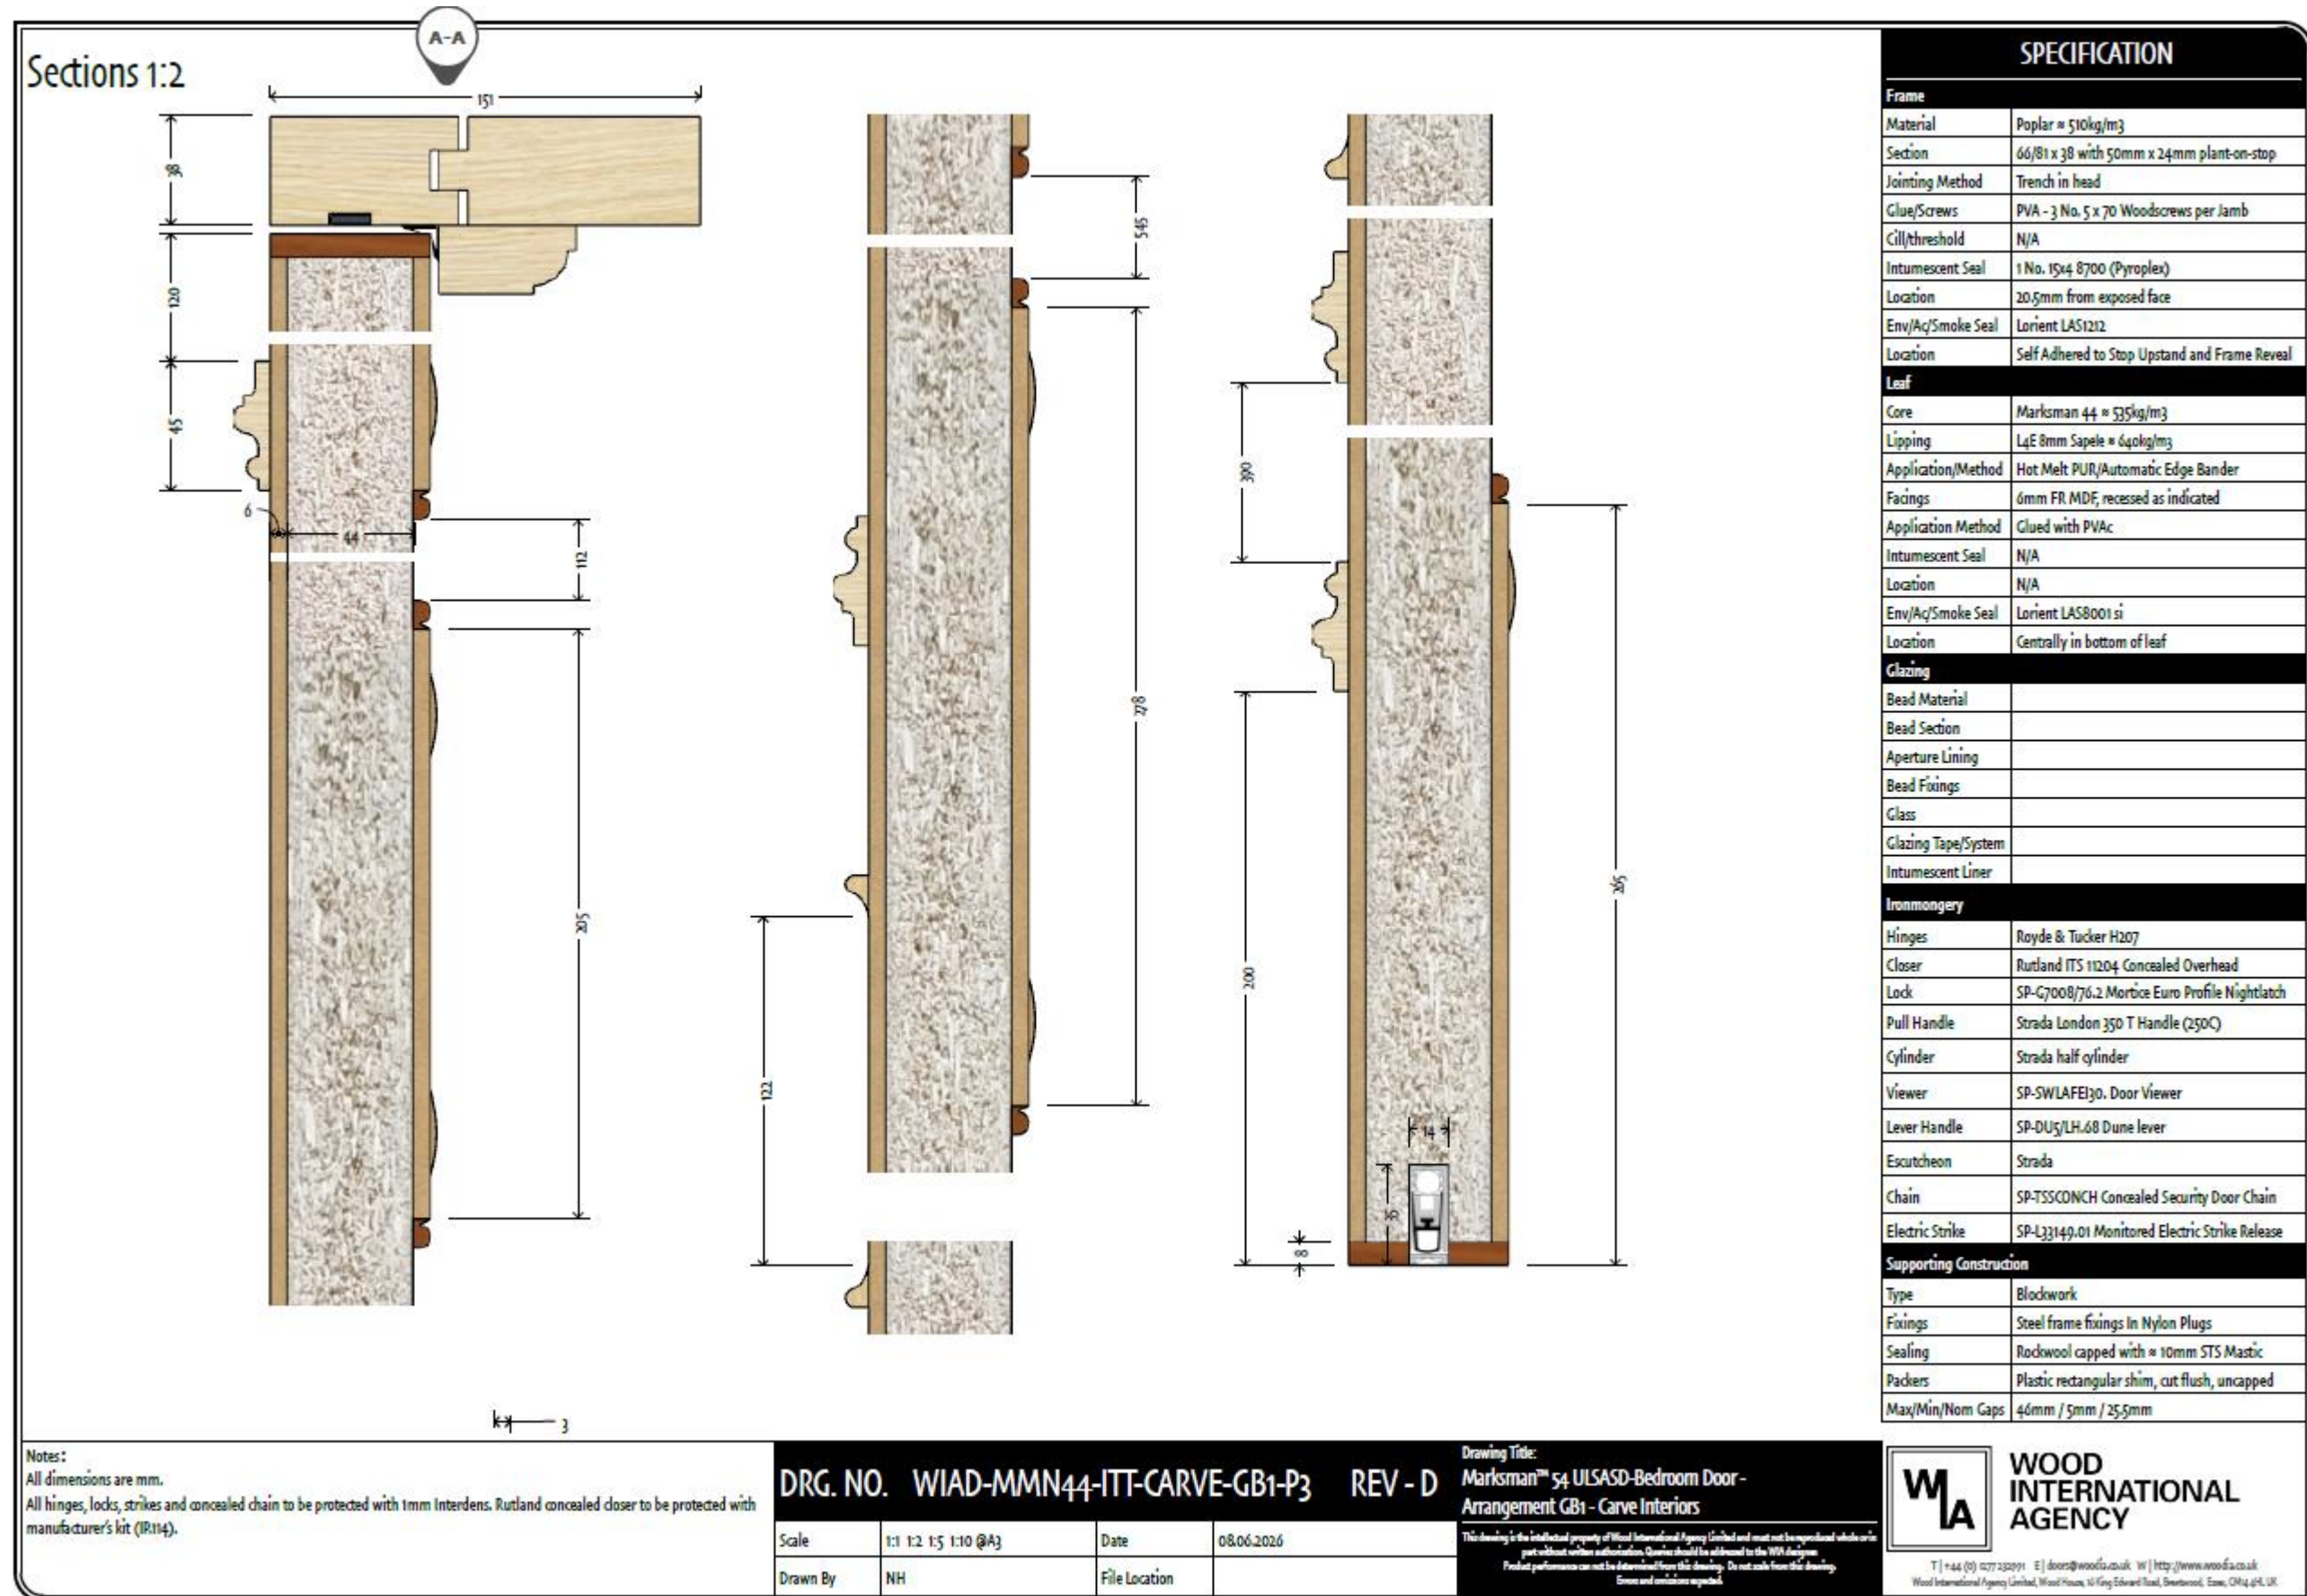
Doorset B - Drawing No. WIAD-MMN44-ITT-CARVE-GB1-P3 Page 3
